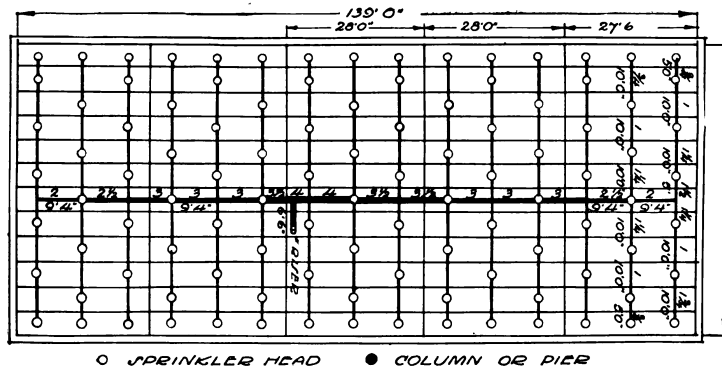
Sprinklers under Semi-Mill Construction in Alternate Bays
